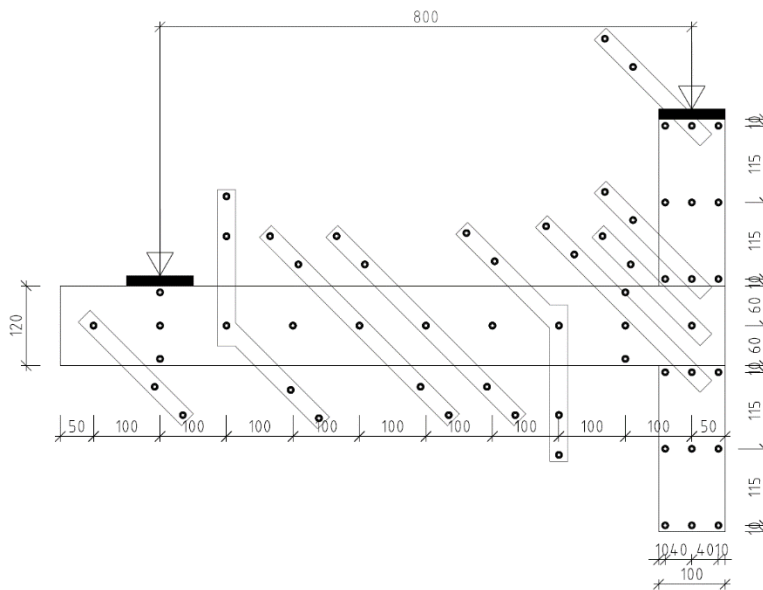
Illustration of distance between markers for test setup with 100 mm wall and 120 mm floor (dimensions in mm).
